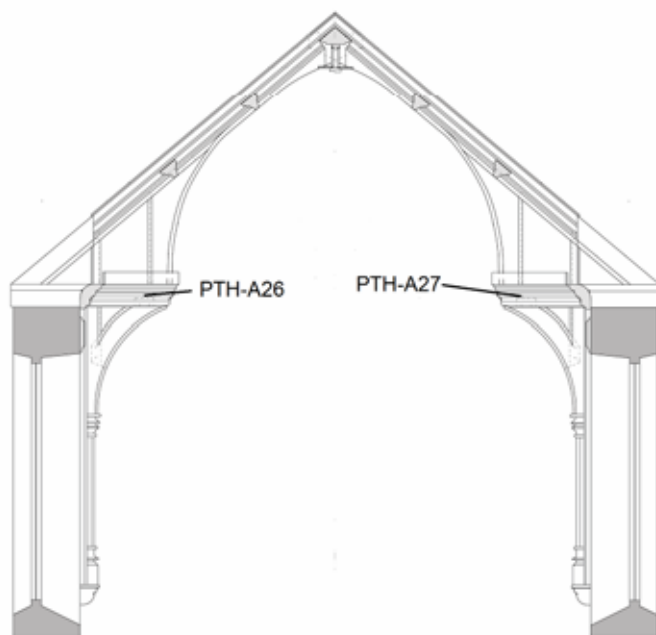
Nave roof, truss EF, showing the location of samples PTH-A26 and PTH-A27 (Nicholas Warns Architects Limited)
